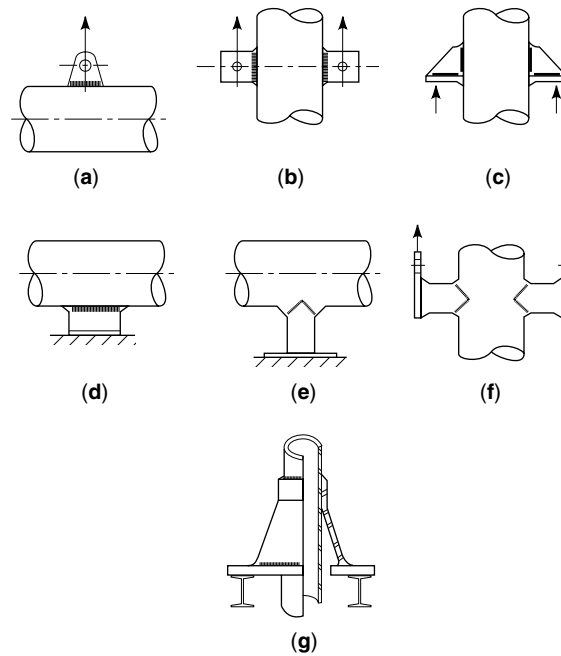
Integral pipe attachments: (a) and (b), ears; (c) lug; (d) shoe; (e) and (f), cylindrical trunnions; and (g) skirt.
